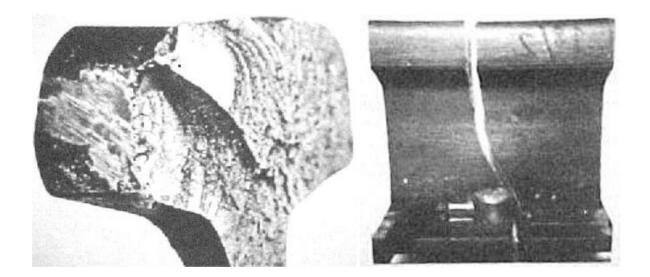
472 - WELDING, BUILDING UP, BUILT UP PART BREAKS AWAY
